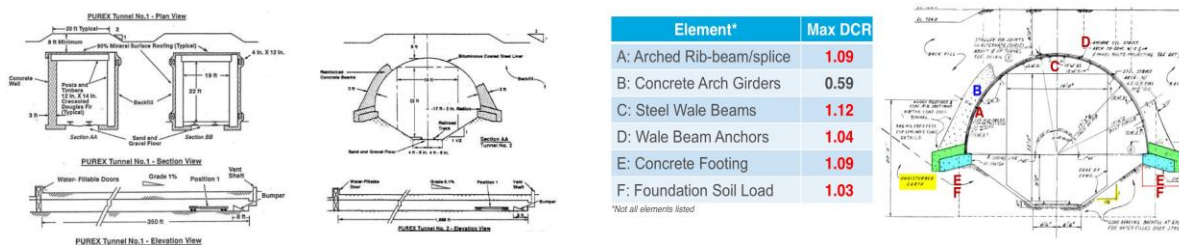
Cross-sectional design inputs for Tunnels 1 and 2 and DCR for Tunnel 2.
